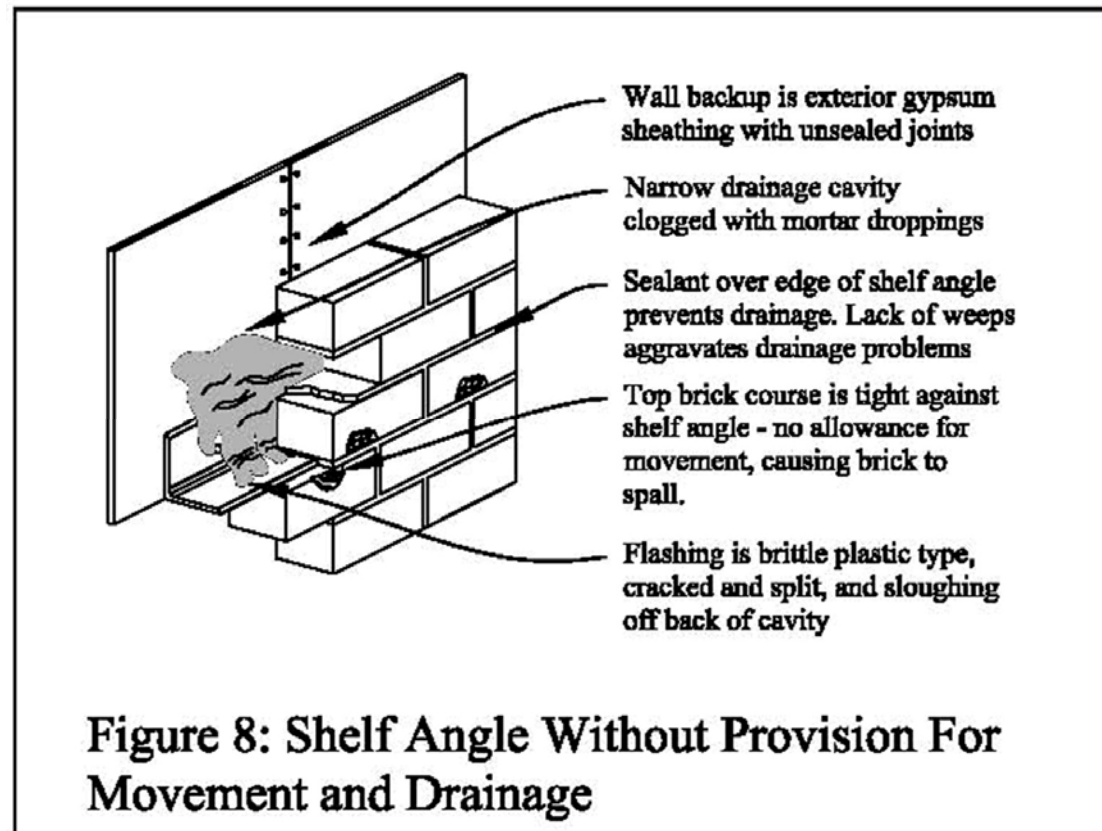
This wall has many inherent defects with the flashing and cavity wall drainage
